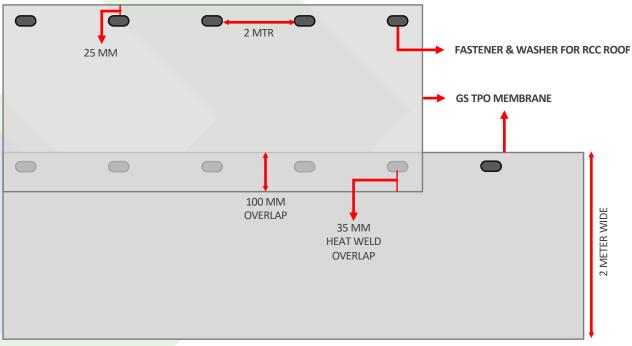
Mechanically fastened membrane installation & heat welding system
